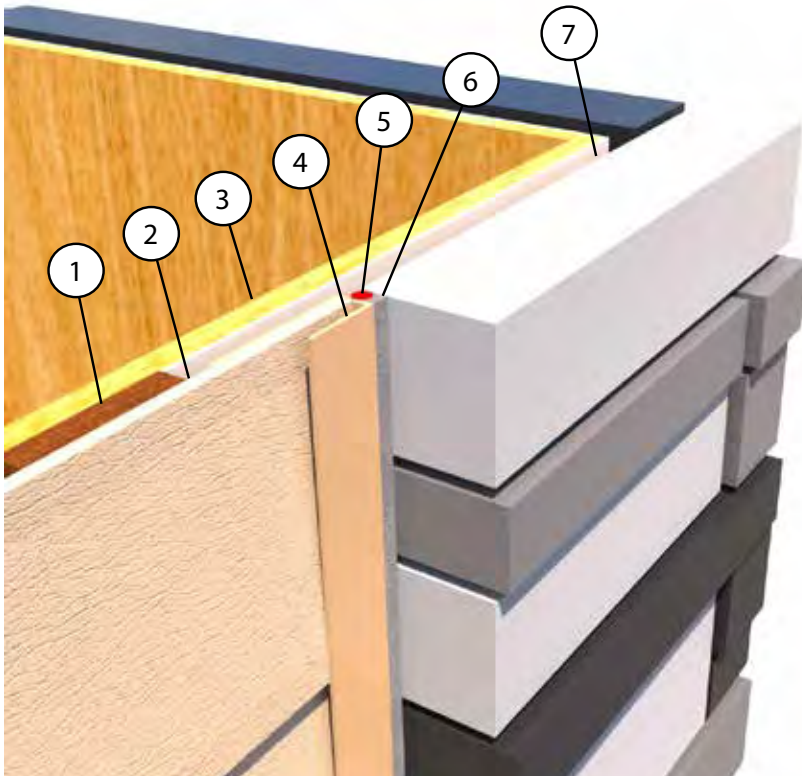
### DETAIL INTERIOR CORNER WITH VINYL SIDING
